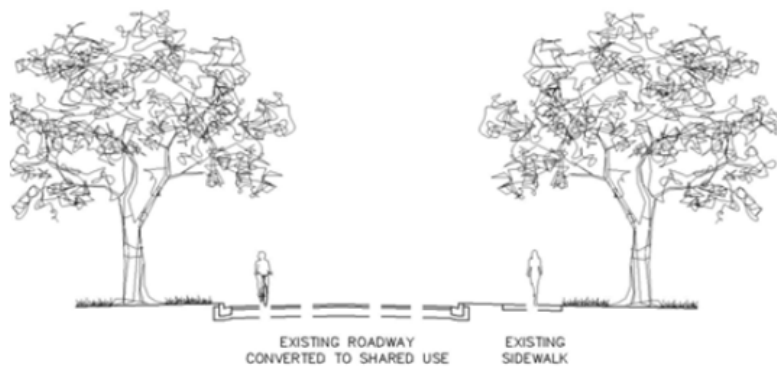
TYPICAL TRAIL AND EXISTING SIDEWALK
